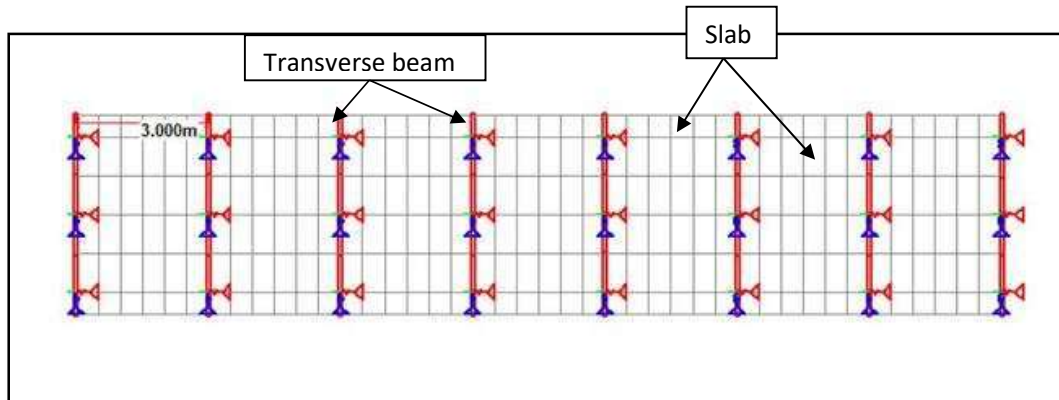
Deck System showing Transverse beam spaced 3m c/c along road stretch
